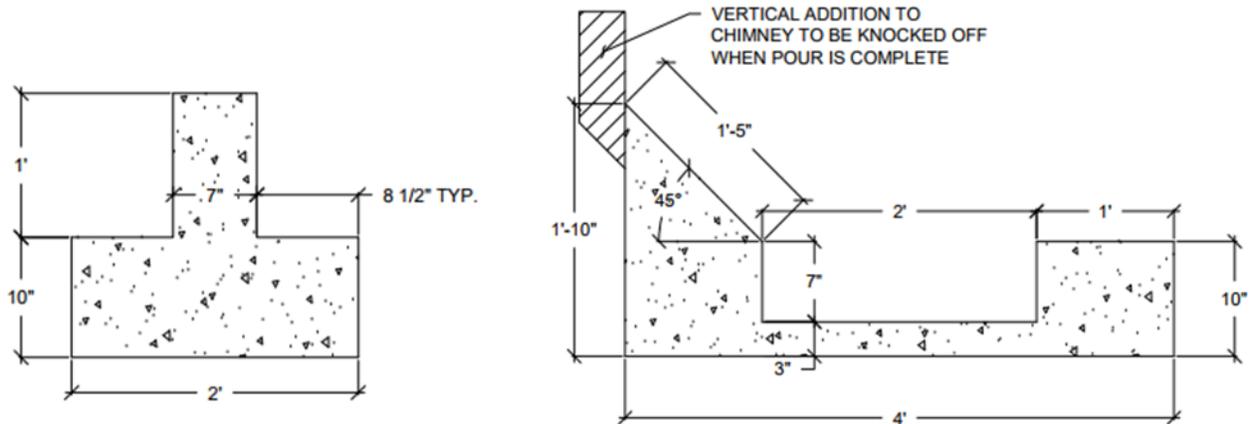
UHPC-flowability test setup design “chimney” cross-section
